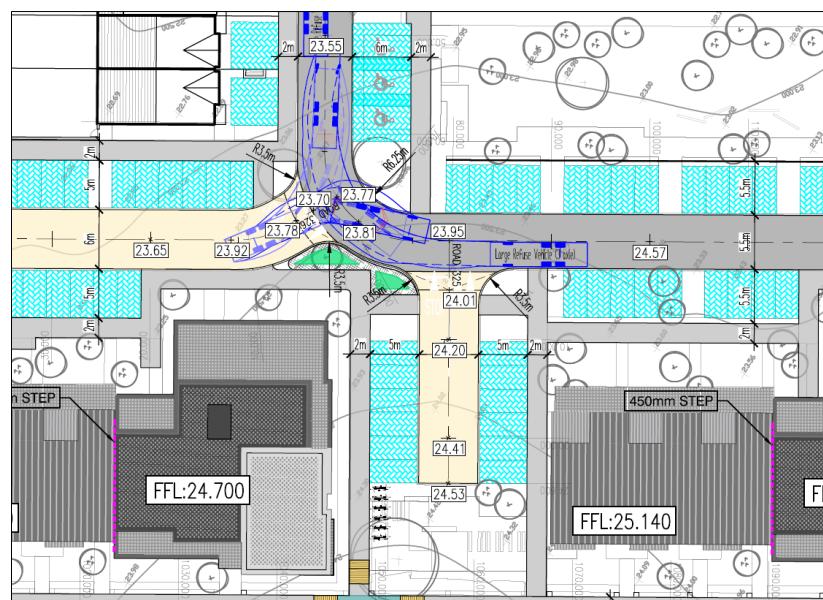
Extract of Road Layout Plan Showing Contrasting Materials in Homezones
